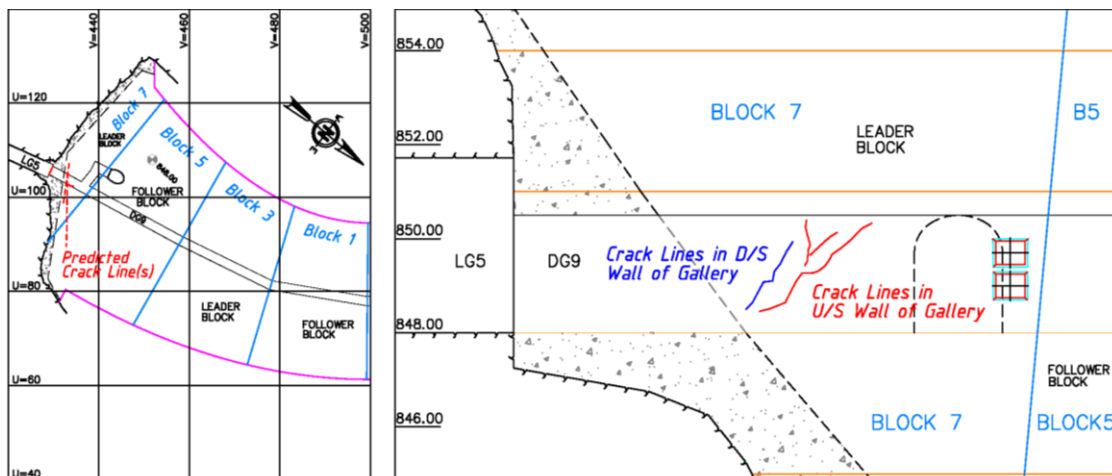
Crack in block 7 in gallery DG9 (at EL. 848masl) - Plan & vertical section through the gallery
